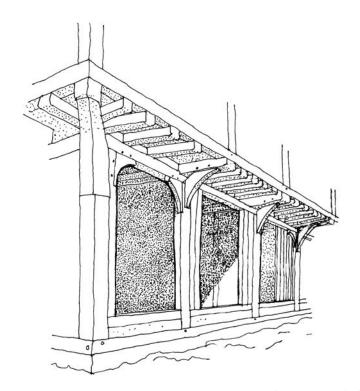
Reconstruction of the shop fronts on George Street (corpus no. 38) (not to scale)
